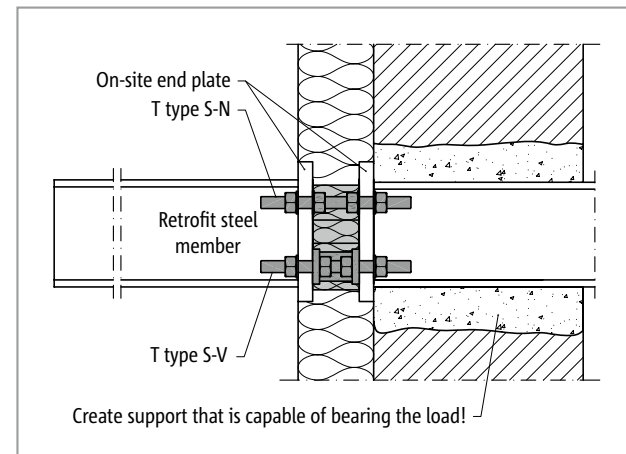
Schöck Isokorb® T type S for retrofitted cantilevered steel structure; further examples of renovation see p. 90
